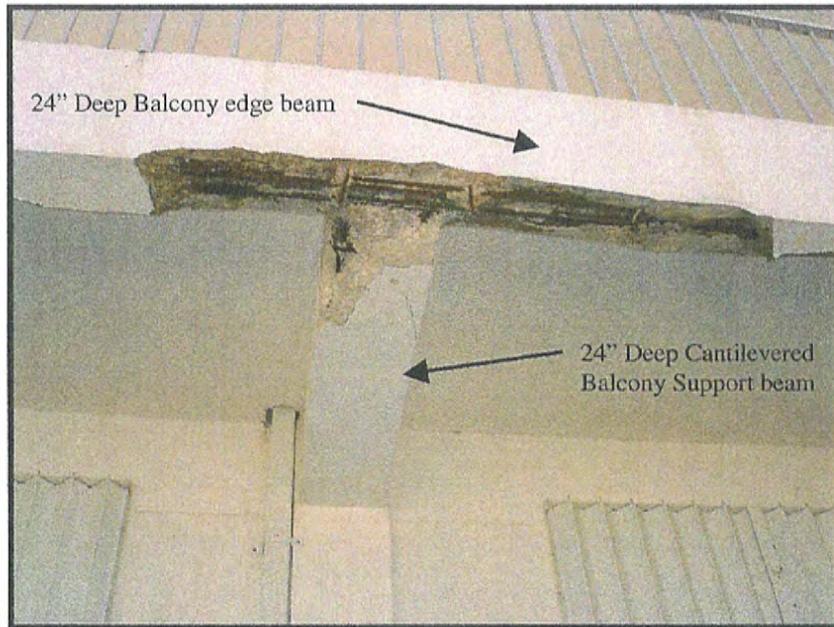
Concrete spall with exposed corroded reinforcement on bottom face of balcony edge beam along the West side of building.
